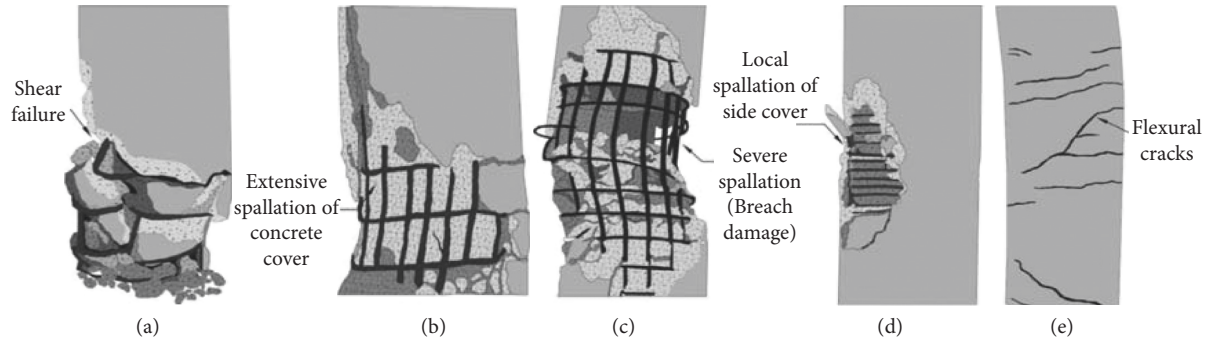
Typical failure modes of RC bridge column under blast load [6]: (a) brittle shear failure; (b) medium spall damage of concrete cover; (c) severe spall damage; (d) local spall damage of concrete cover; (e) flexural failure.
